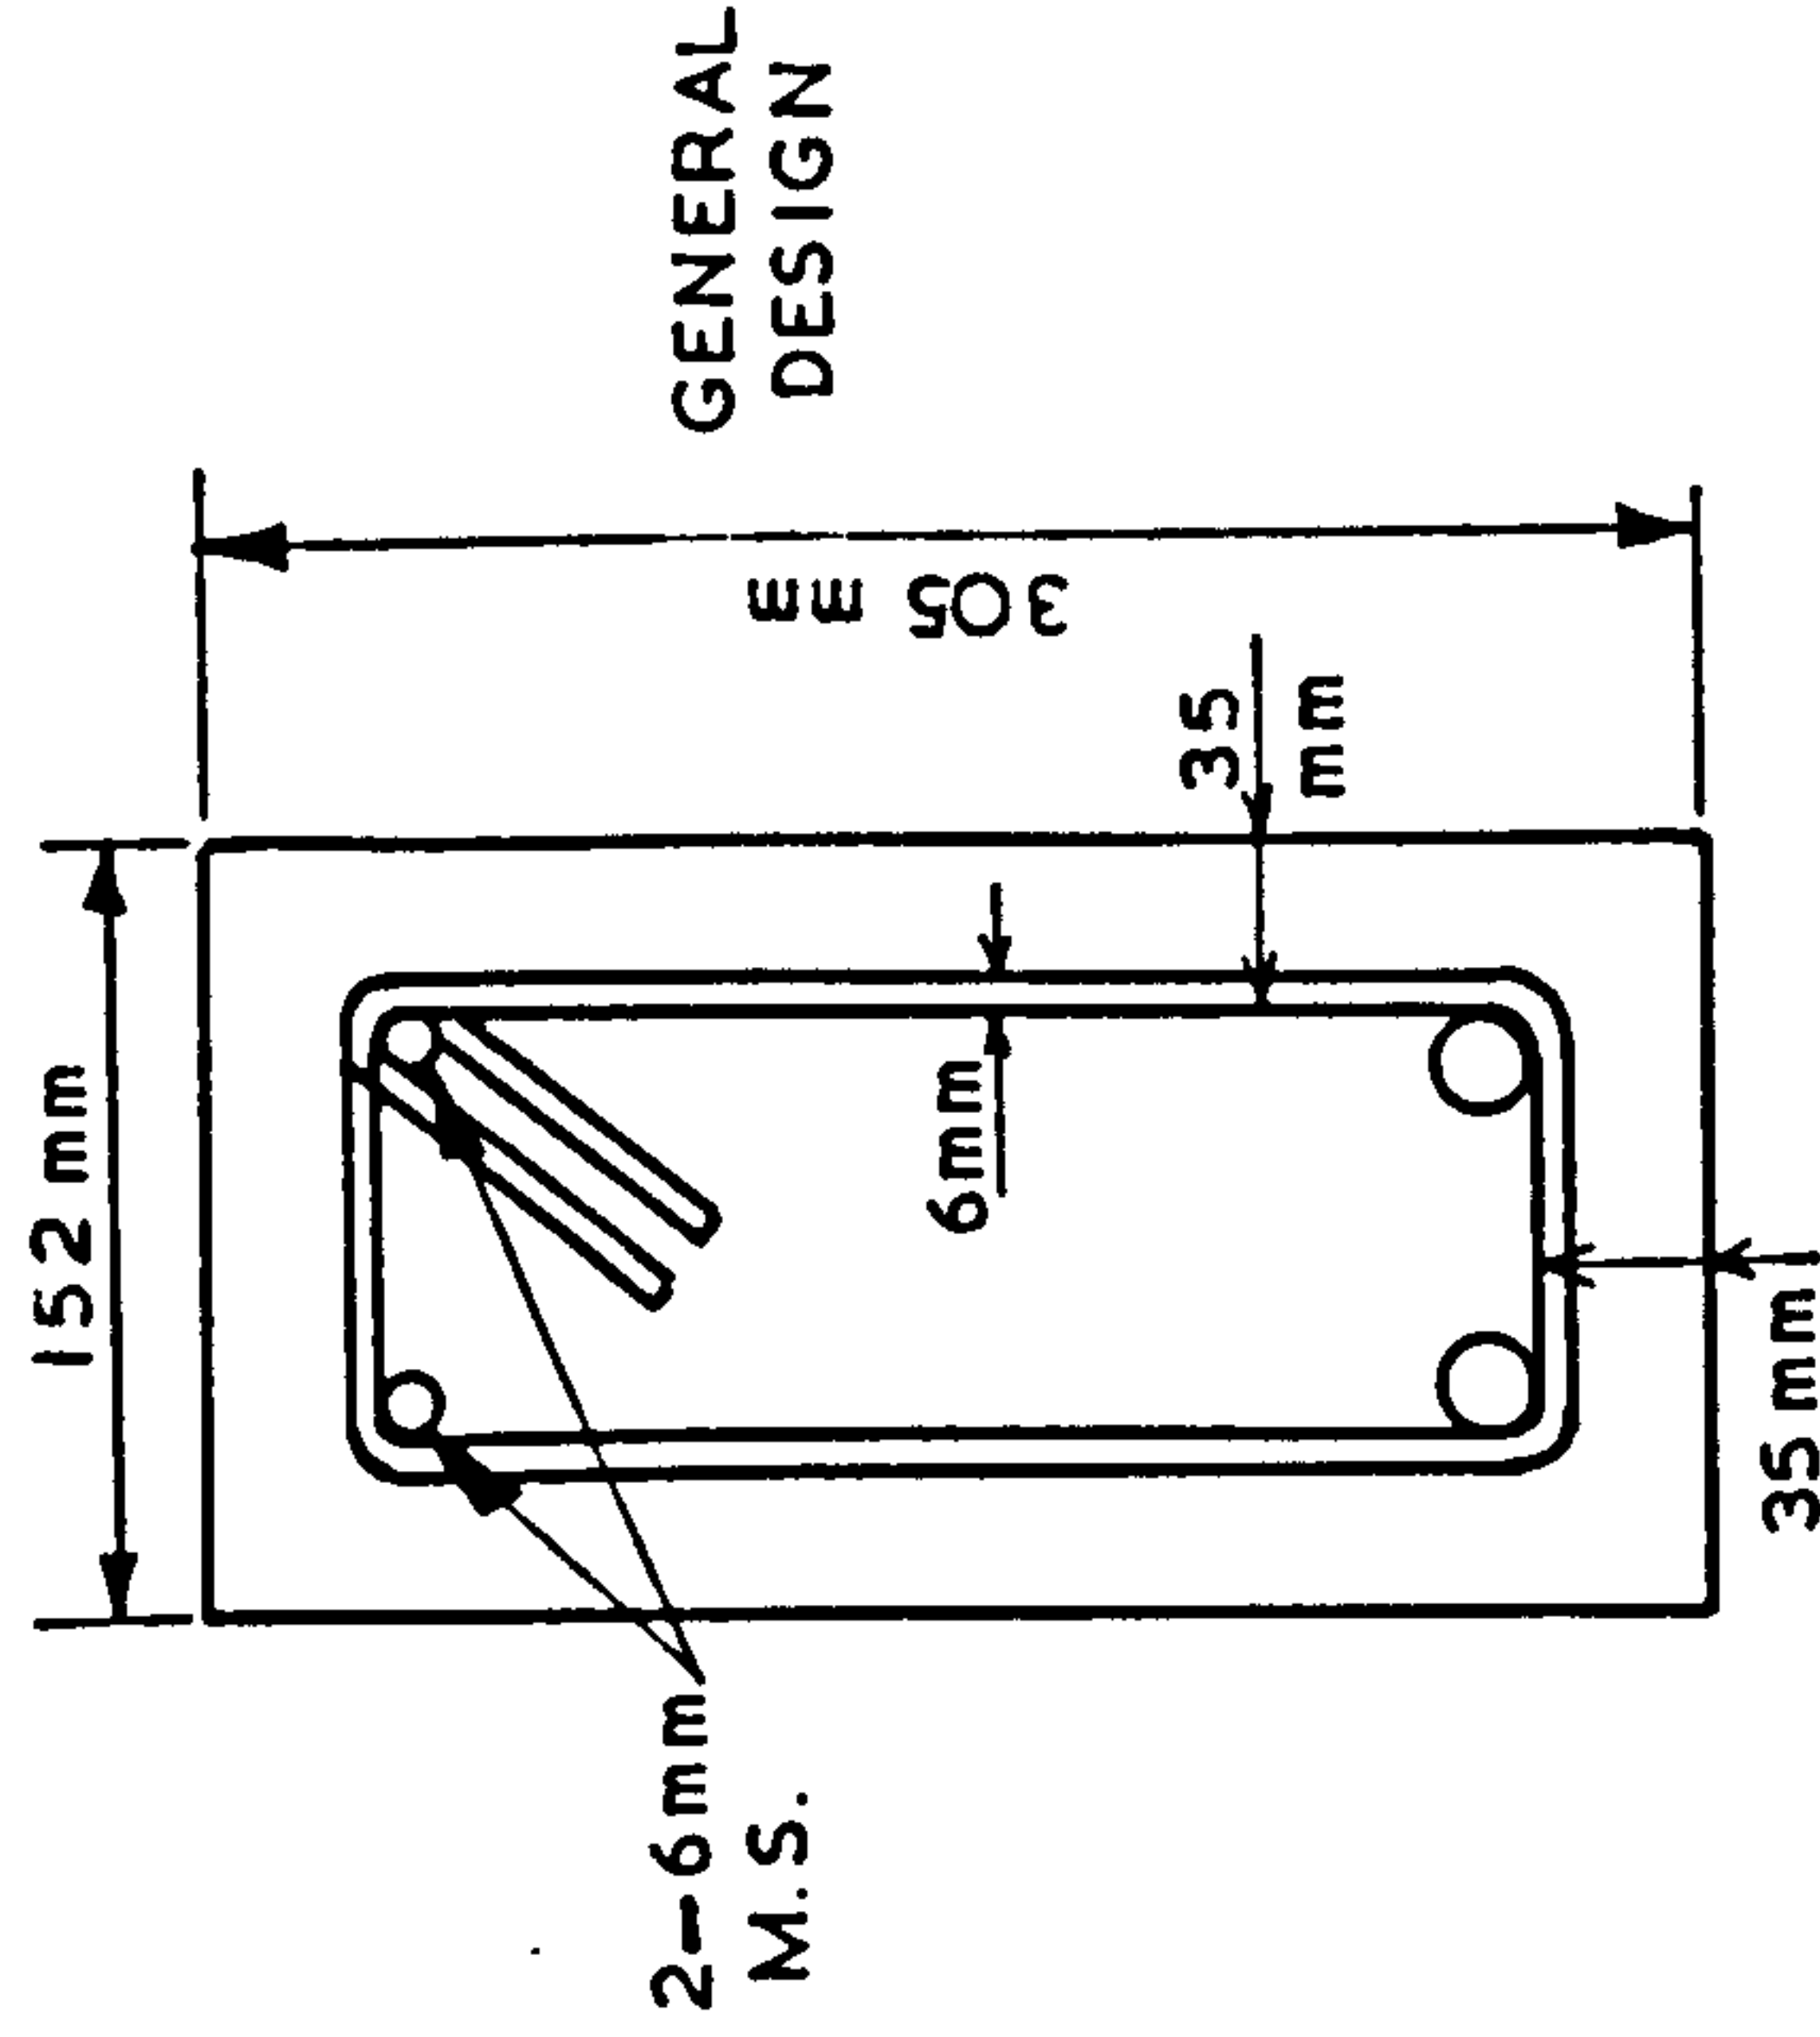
SECTION - DIMENSIONS FOR ALL BEAMS
